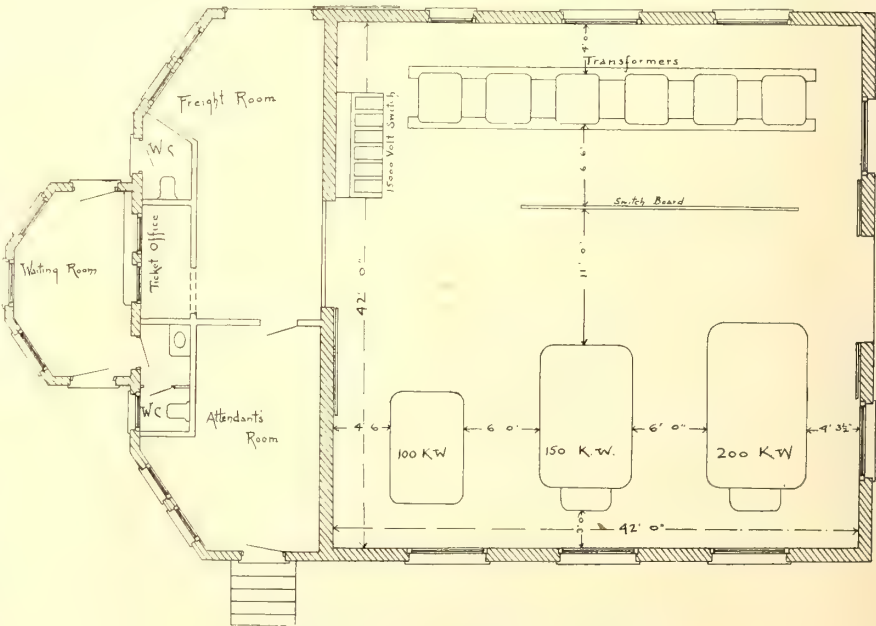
PLAN OF BELVIDERE SUB-STATION
